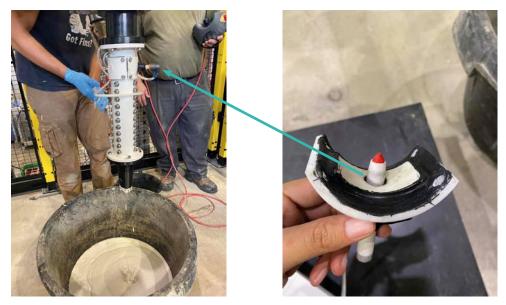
3D printing experiments conducted at Buildwise. Injecting setting accelerator into the print head equipped with a dynamic mixer.
